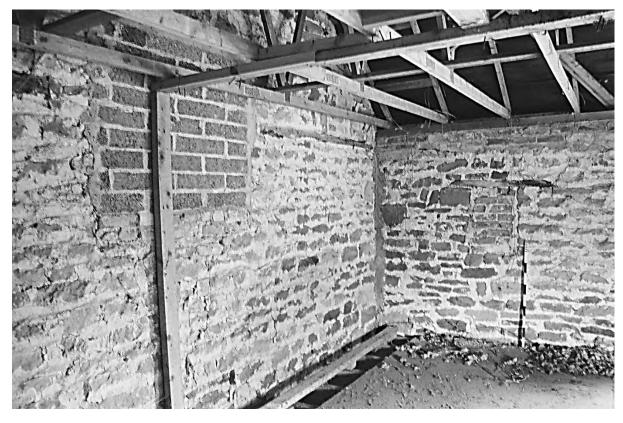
Farm Building 5: Room 5.8 Blocked Slit (Film 1/13). Facing South-west.
